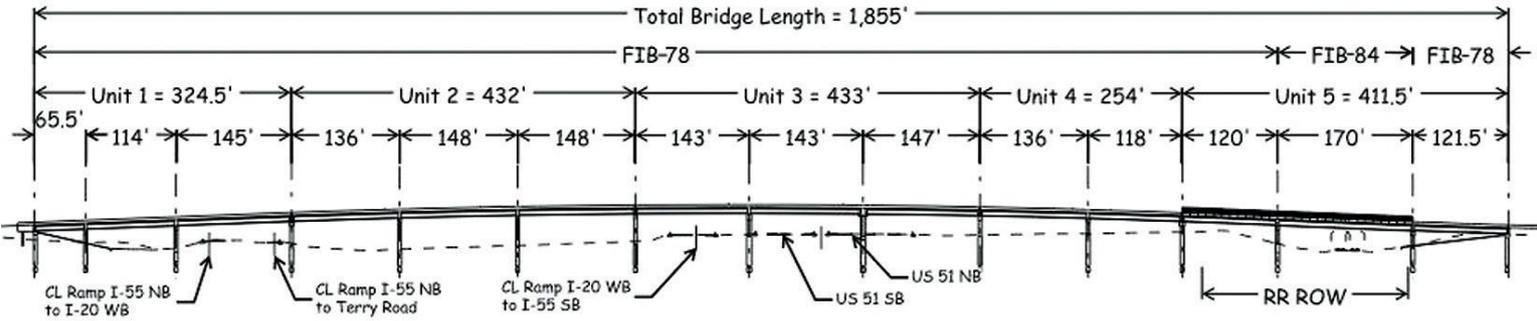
Value-engineered solution with prestressed concrete beams. Span 1 is at the west end (left).
